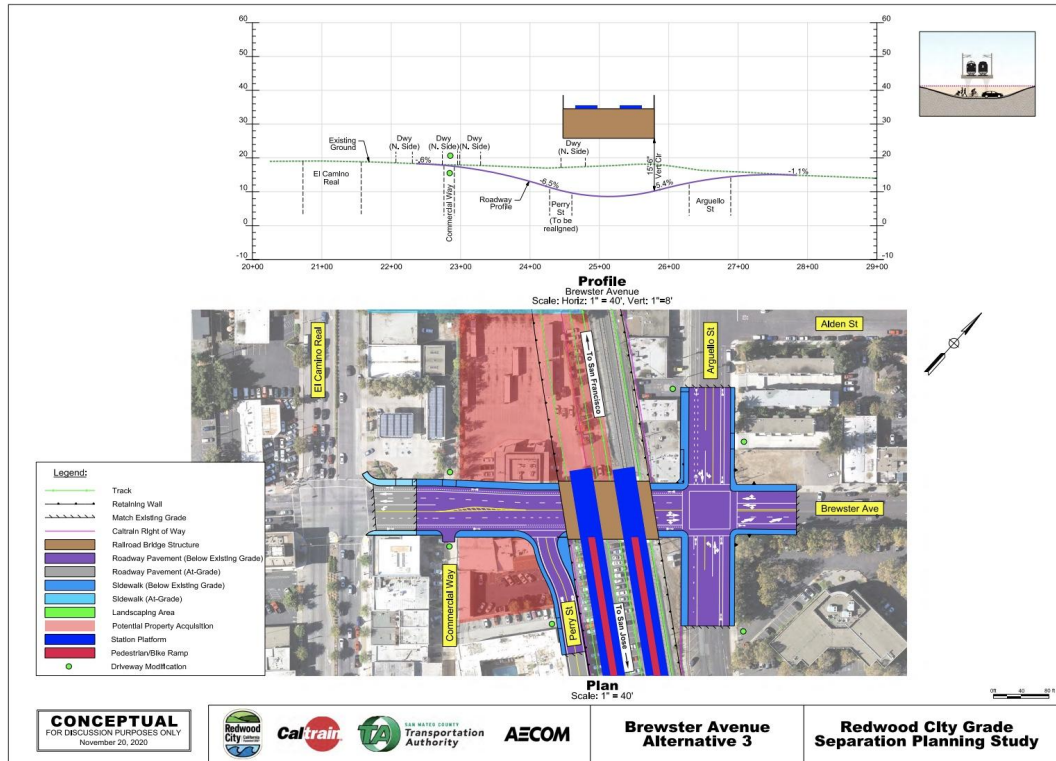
Changes to Brewster Avenue for Design Alternative 3 (Redwood City, 2020)
